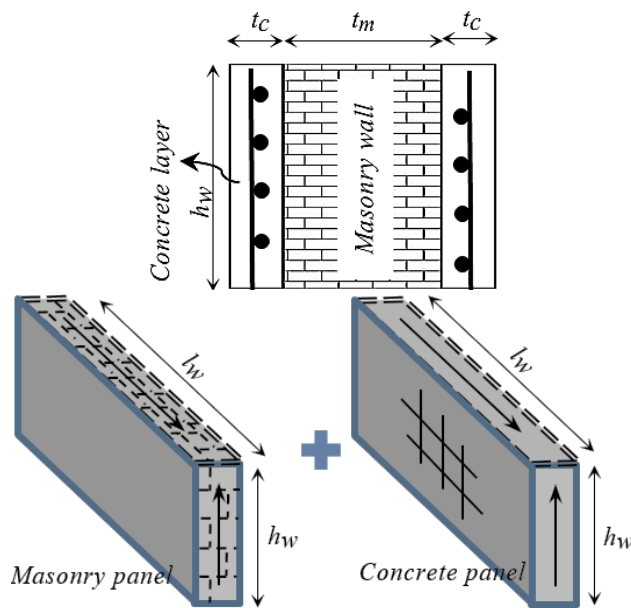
Proposed procedure for masonry wall strengthening with reinforced concrete layer placed
